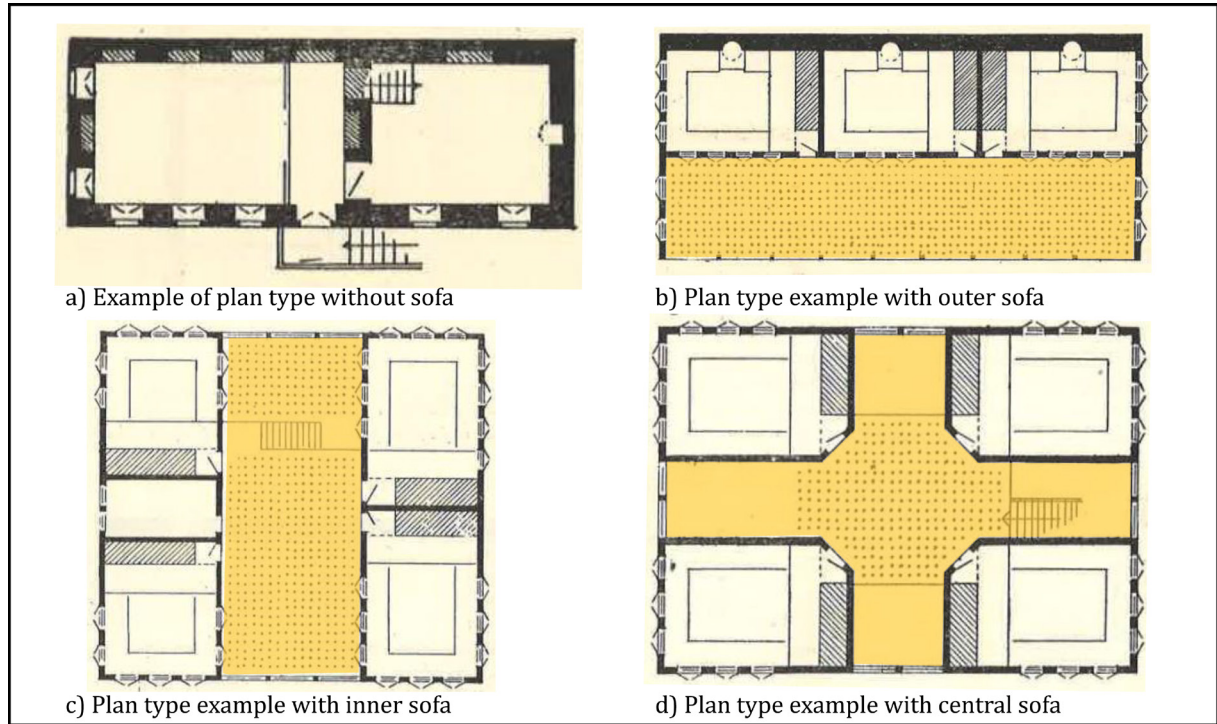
Turkish House plan types / *Türk Evi plan tipolojisi* (Eldem, 1954, p. 27, 34, 93,130)
